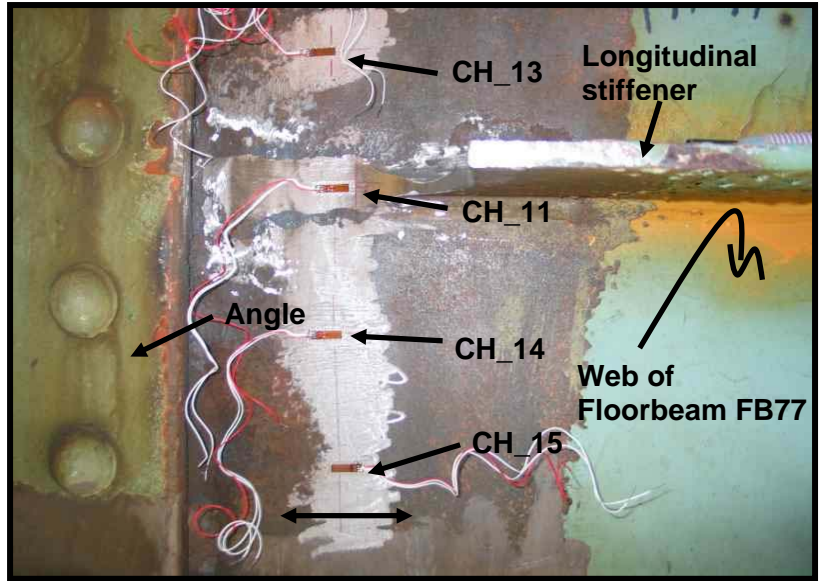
CH_13, CH_14, and CH_15 installed on the web of floorbeam FB77 below the cutout in-line with CH_3 and CH_11 installed on the web at the termination of the longitudinal stiffener (View looking north)
